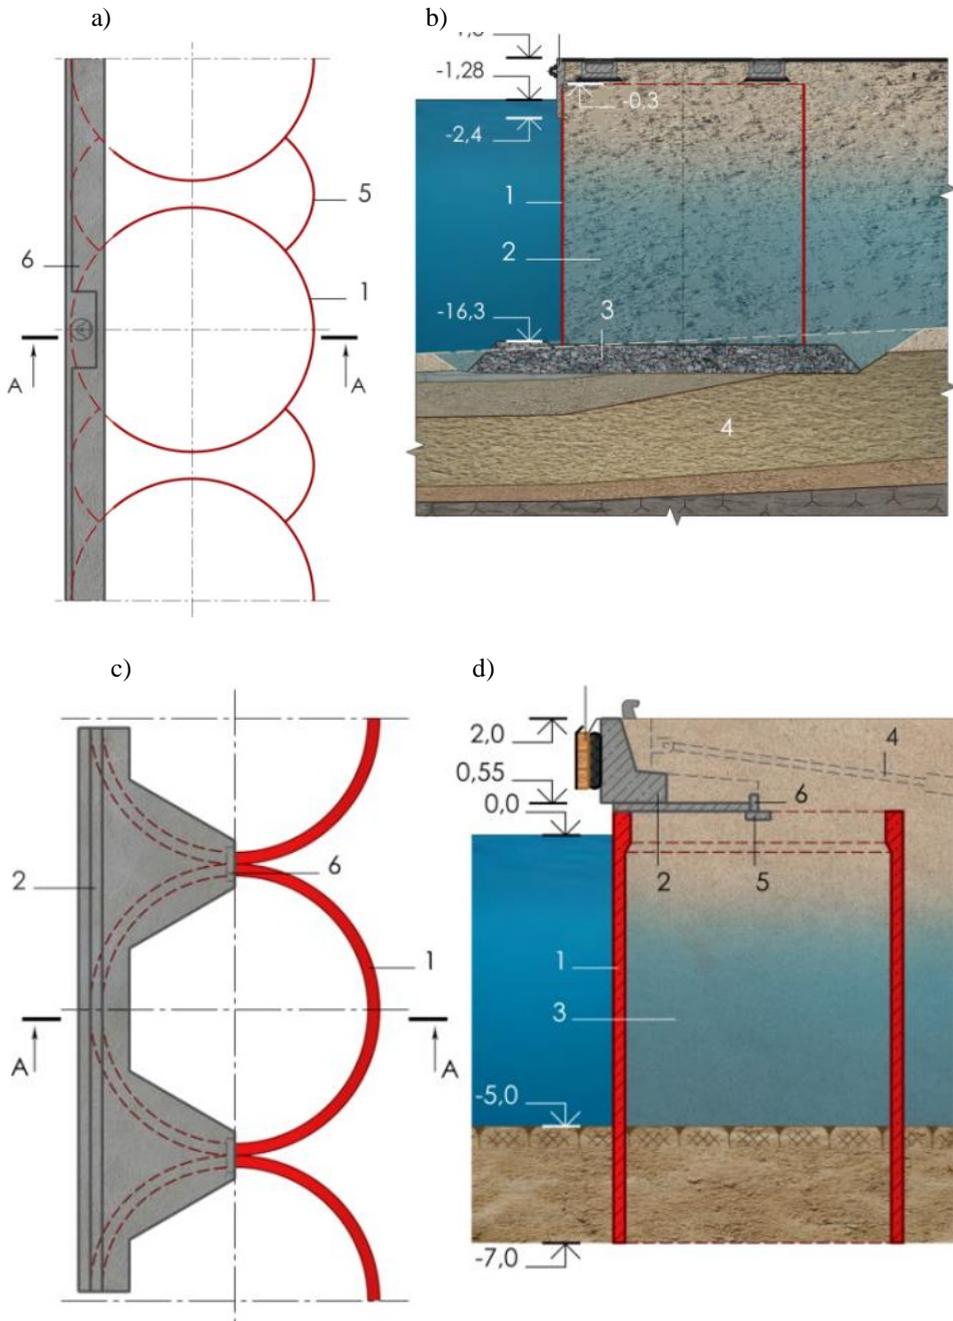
Infilled gravitational shells: a, b – moorage wall at the Port of Vladivostok, Russia (1 – steel shell, 2 – ground infill, 3 – rubble base, 4 – foundation loamy soil); c, d - partially buried shell of Riga bund, Latvia (1 – shell, 2 – topside structure, 3 – sand soil infill, 4 – anchor bars, 5,6 – topside structure parts, 7 – fenders).
